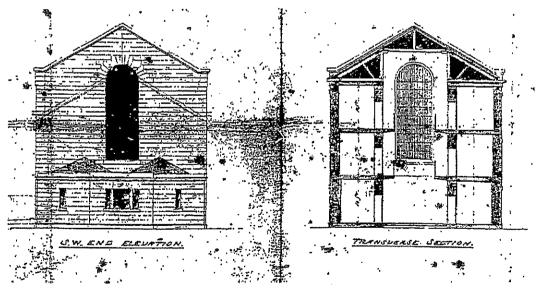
End Elevation and Cross Section of 'B' Wing, Signed Mortimer William Lewis, 23 August 1866 (Detail from DPW&S Plan Room PC 321/40)
